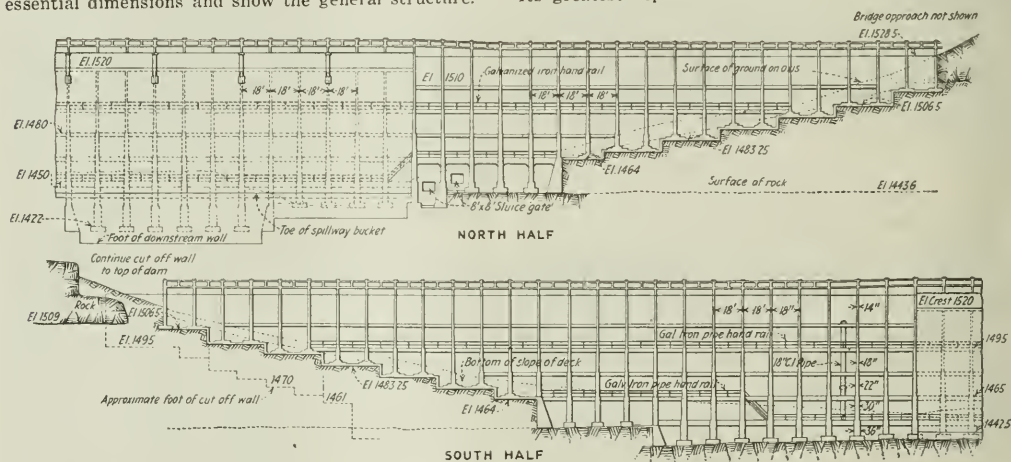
DOWNSTREAM ELEVATION OF CISCO DAM
